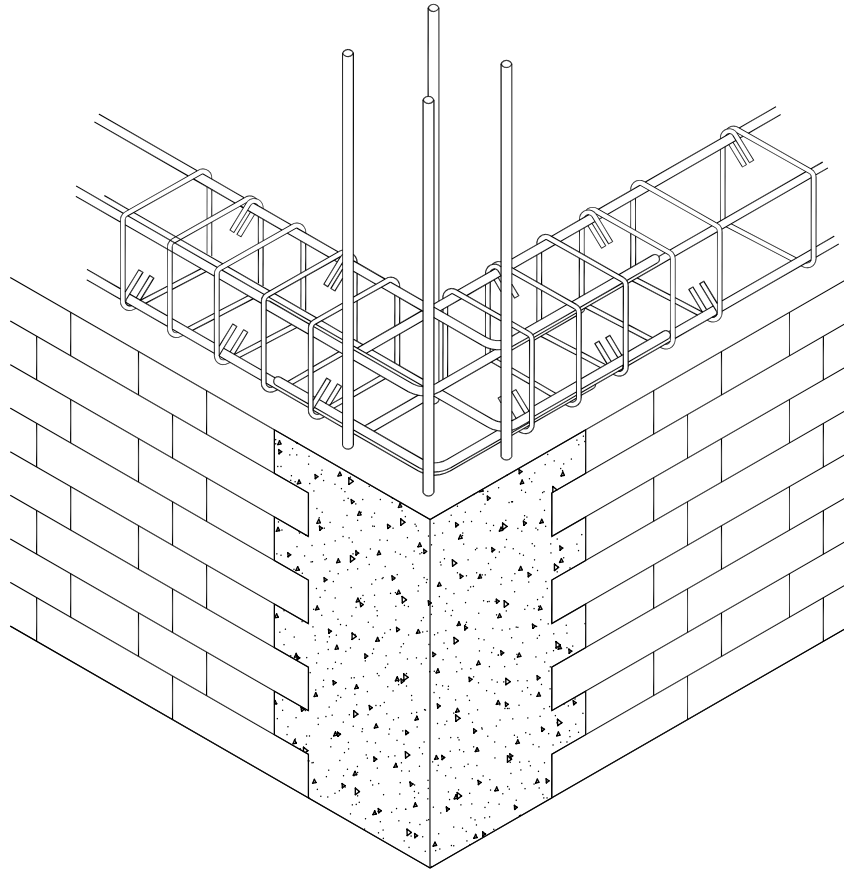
Tie-beam-to-tie-column joint - a recommended practice (EERI, 2011).
